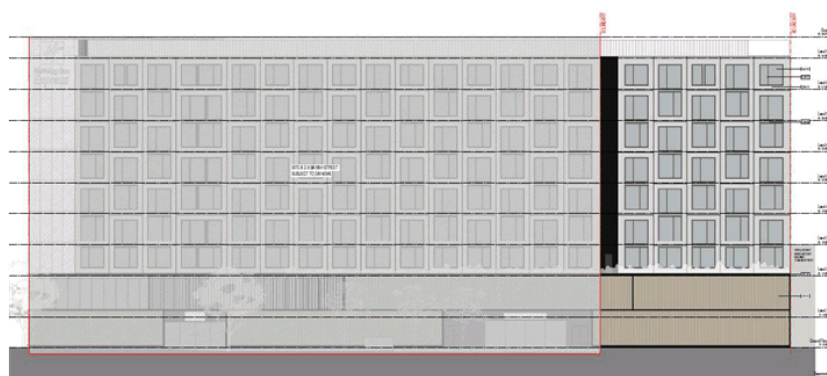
Proposed Northern Elevation (showing 2-8 Sarah Street hatched in grey)
